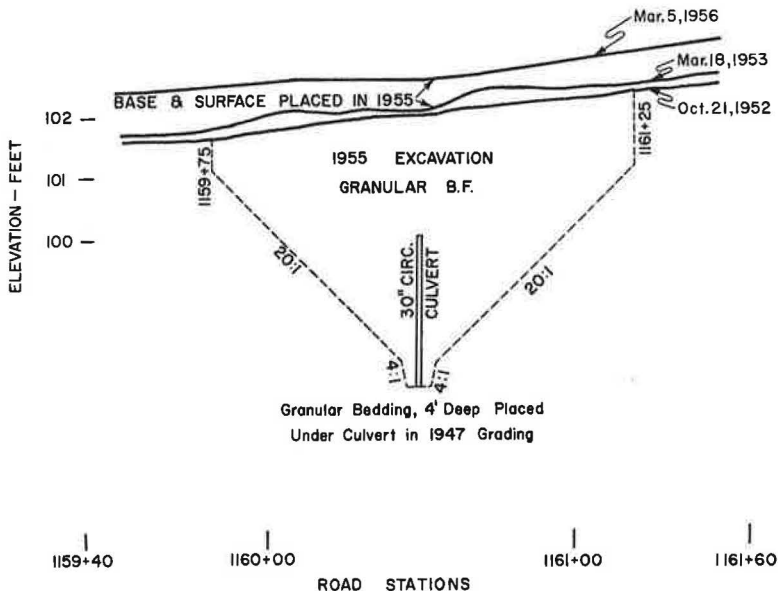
Pipe culvert fill heave and treatment (Minn.).
